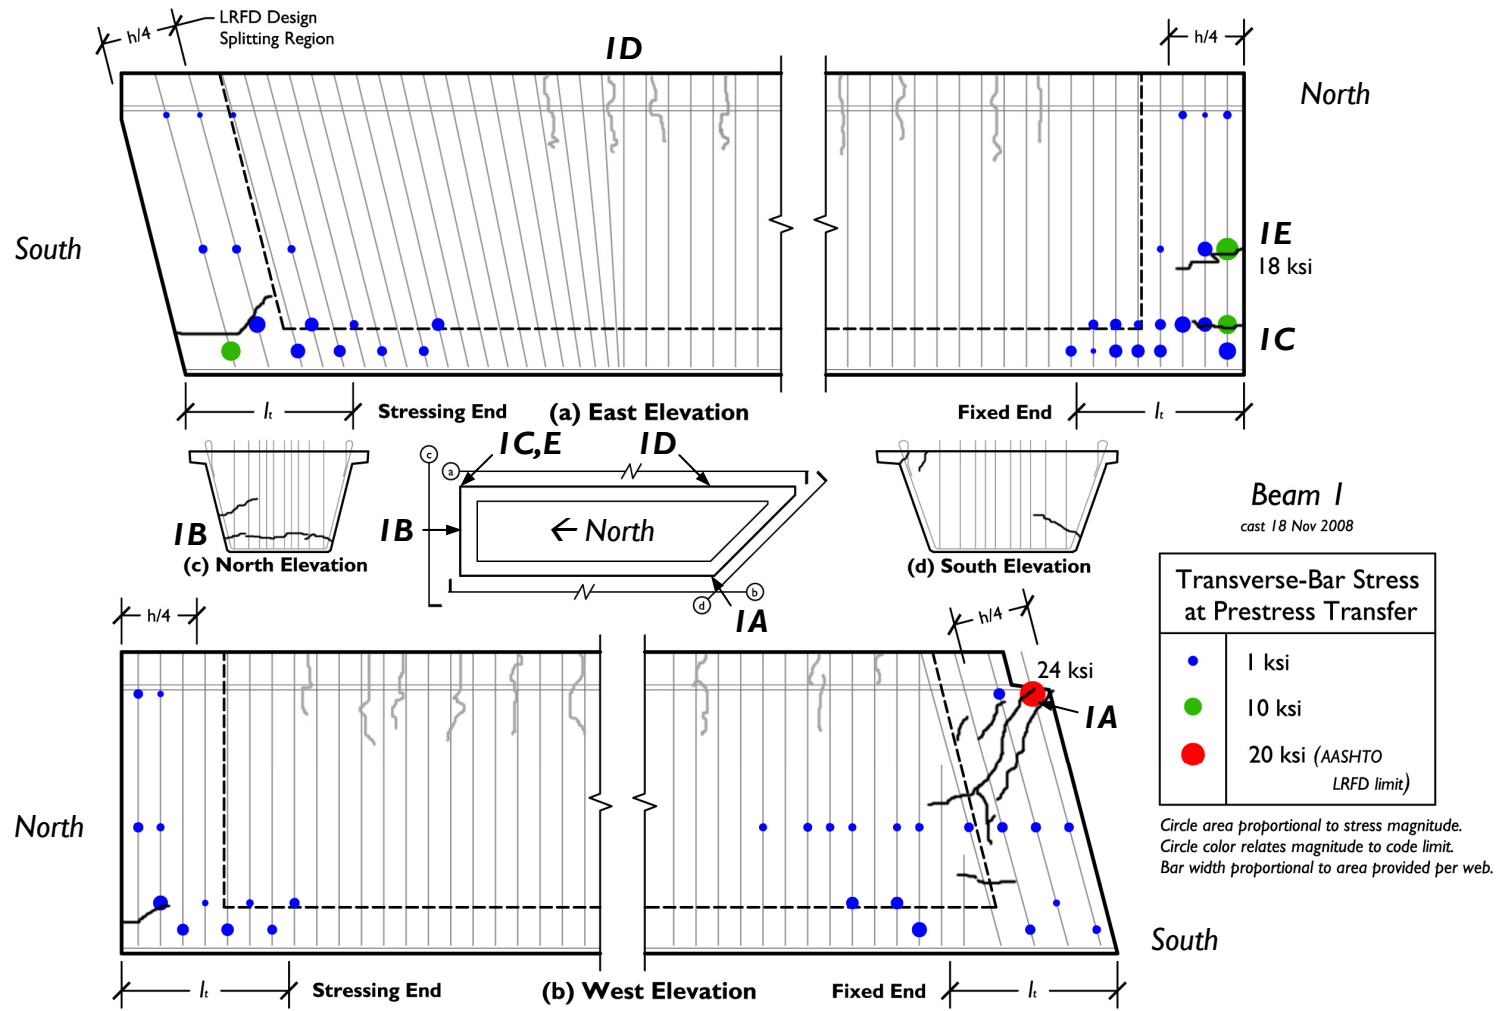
Beam 1 transverse-bar bursting & spalling stresses, with cracking from transfer
